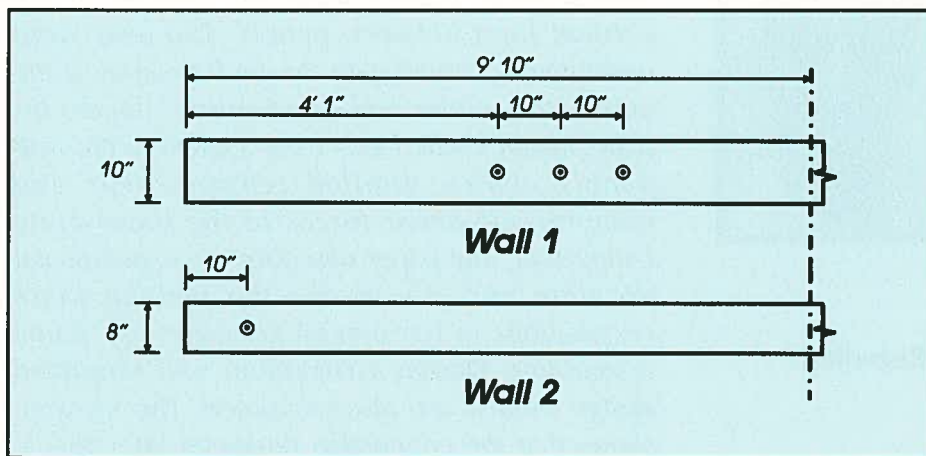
Location of ducts and connecting bars in Walls 1 and 2.
